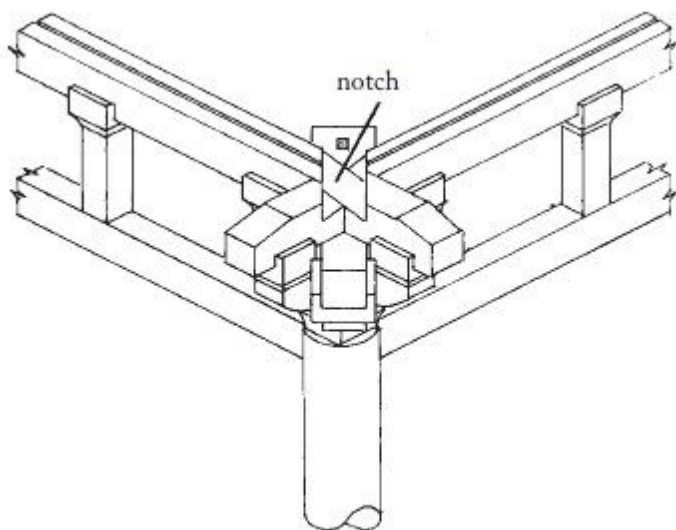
The overlapping of wall purlins at a corner. Note the notch to receive the upper hip rafter.
